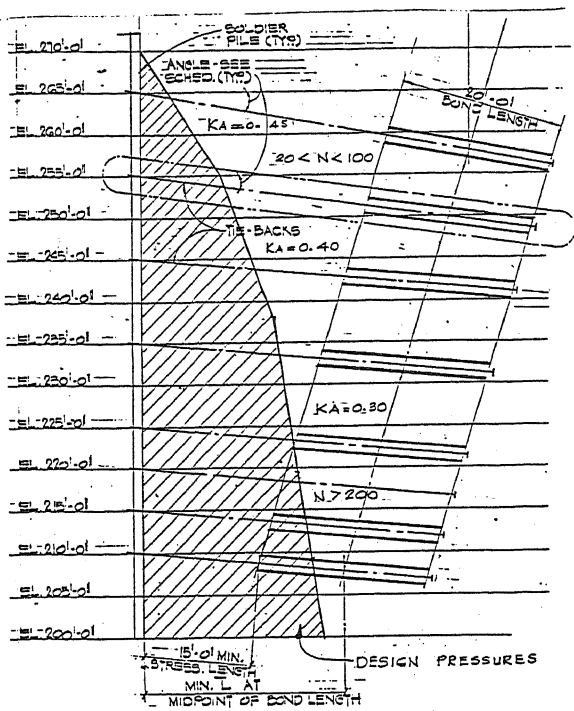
(b) Section thru Tied Anchor Wall including Design Pressures
